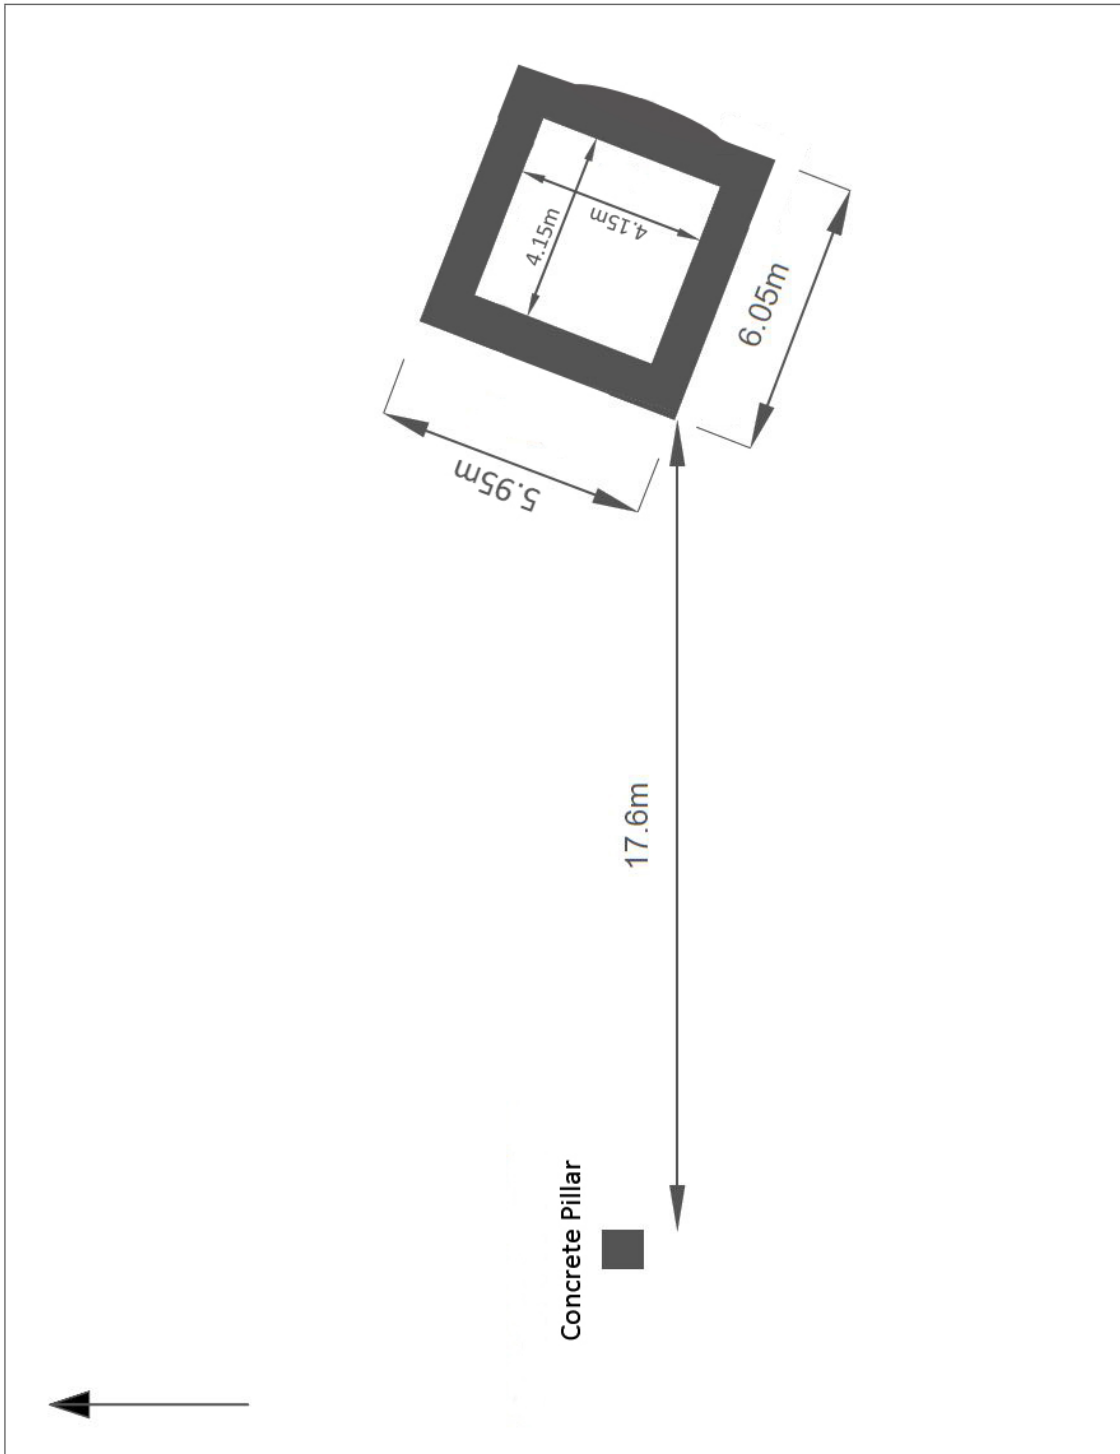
Plan of the signal tower at Mullaghderg Hill Signal Station, and the adjacent concrete pillar.
